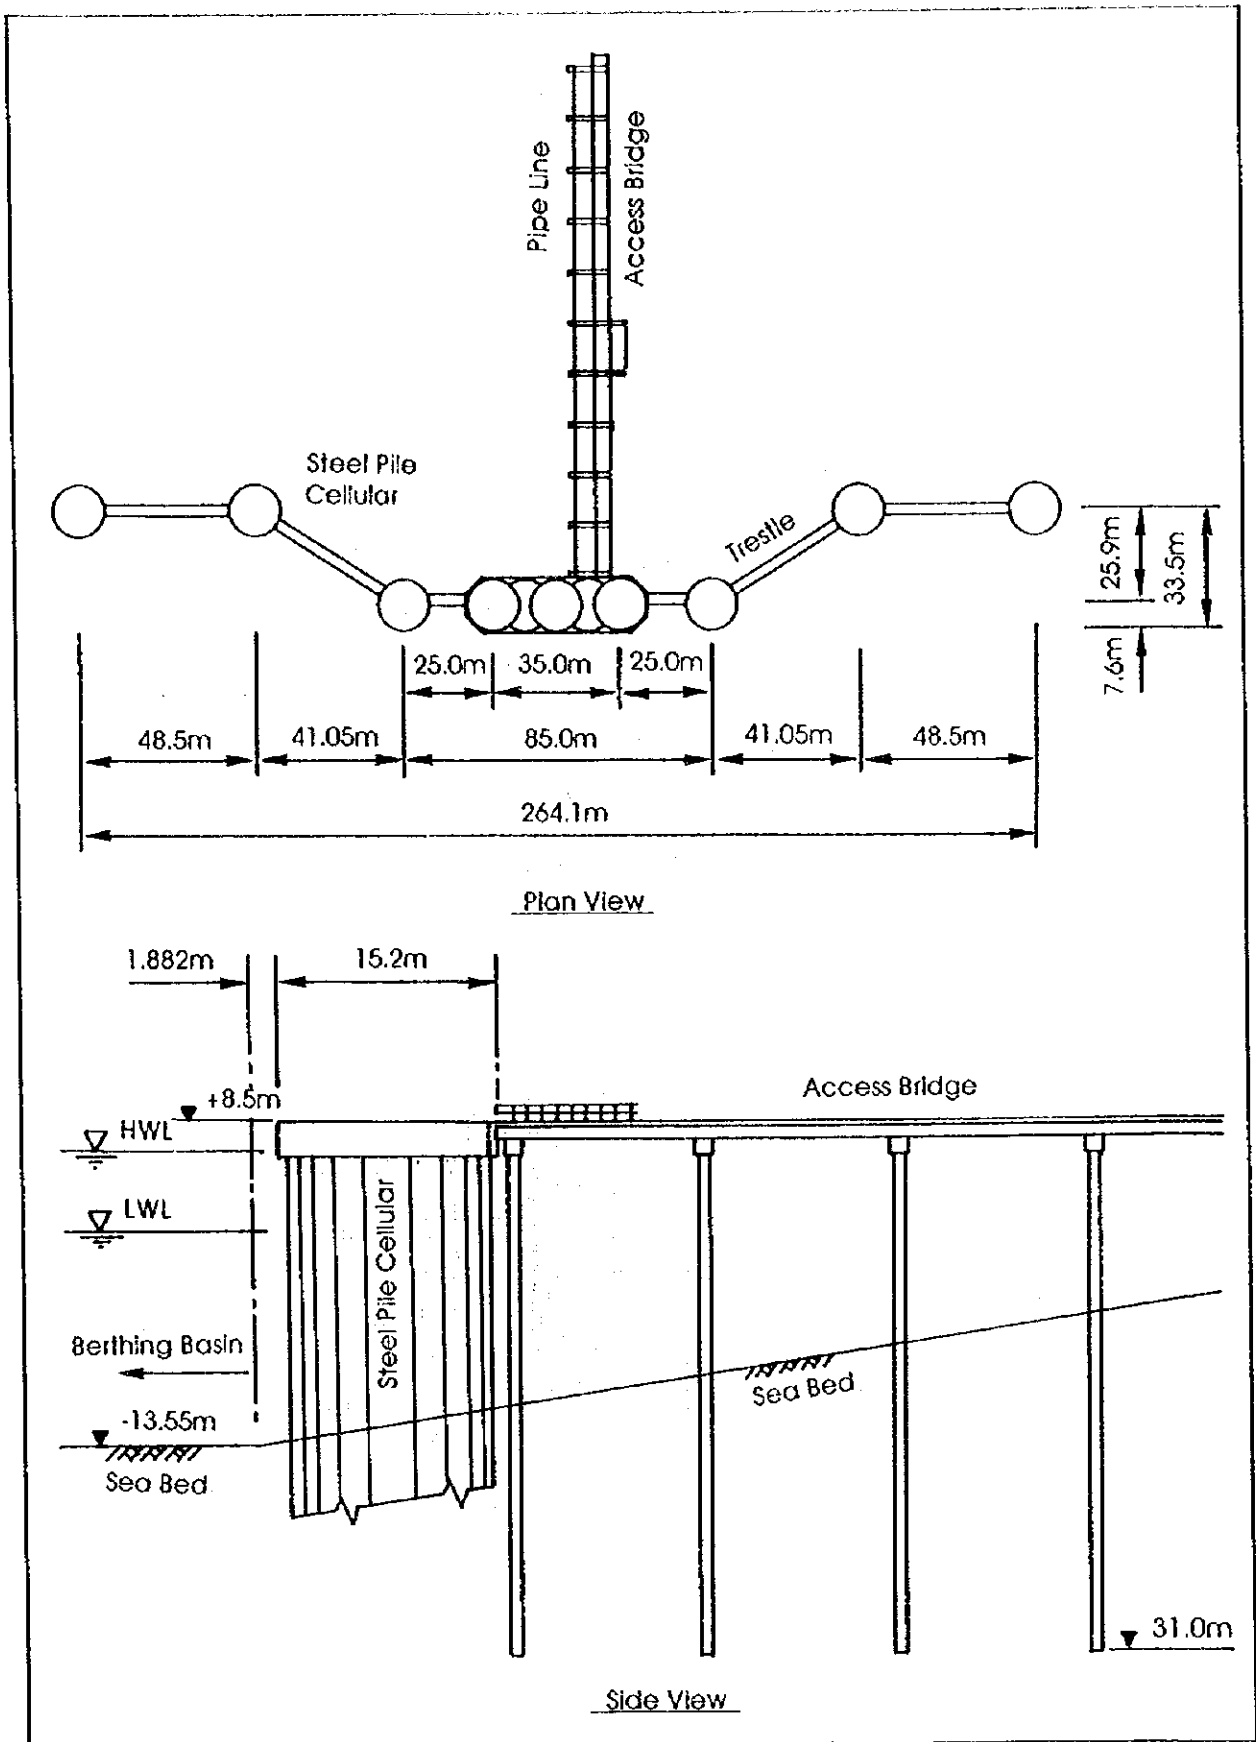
Plan and Cross Section of New Oil Terminal Quay (Quay 12)
